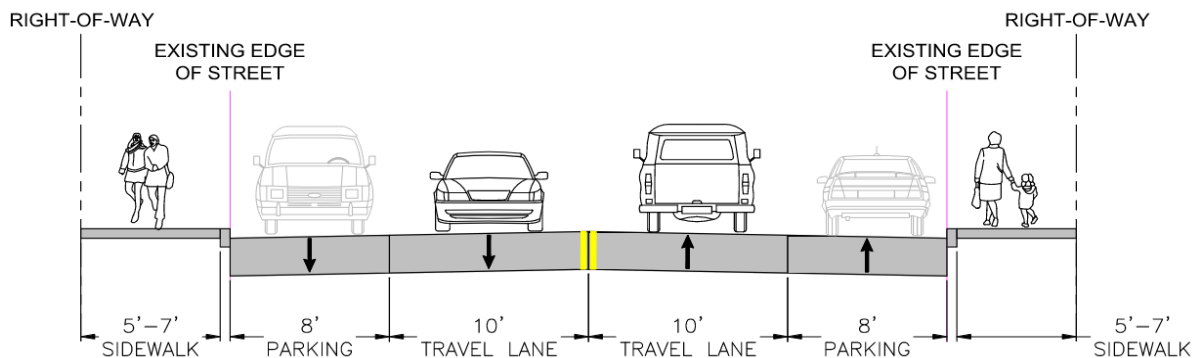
Coleman Avenue Existing Cross Section (City of Menlo Park) Looking East Toward Willow Road
